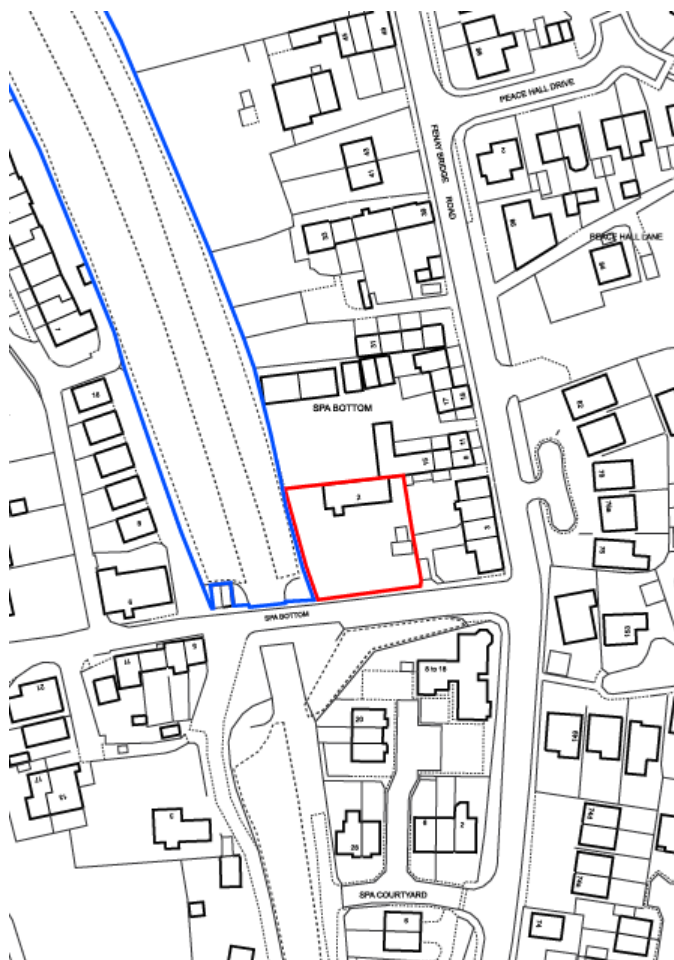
Site Plan – Application site is in Red and other Applicant Land in Blue.
